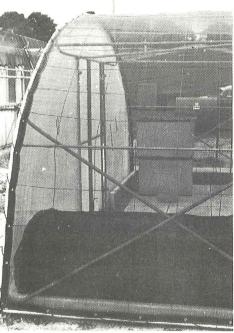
Fastening prefabricated shade-cloth covering to the tunnelhouse frame.
